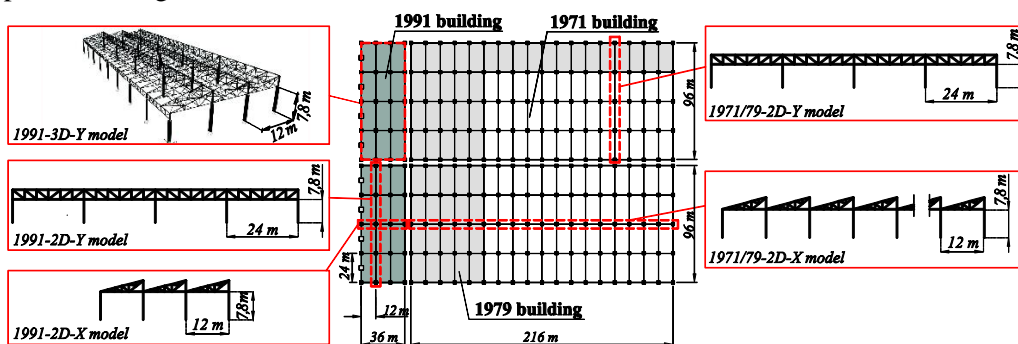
Structural models for 1991 and 1971/79 portions of the case study buildings.
